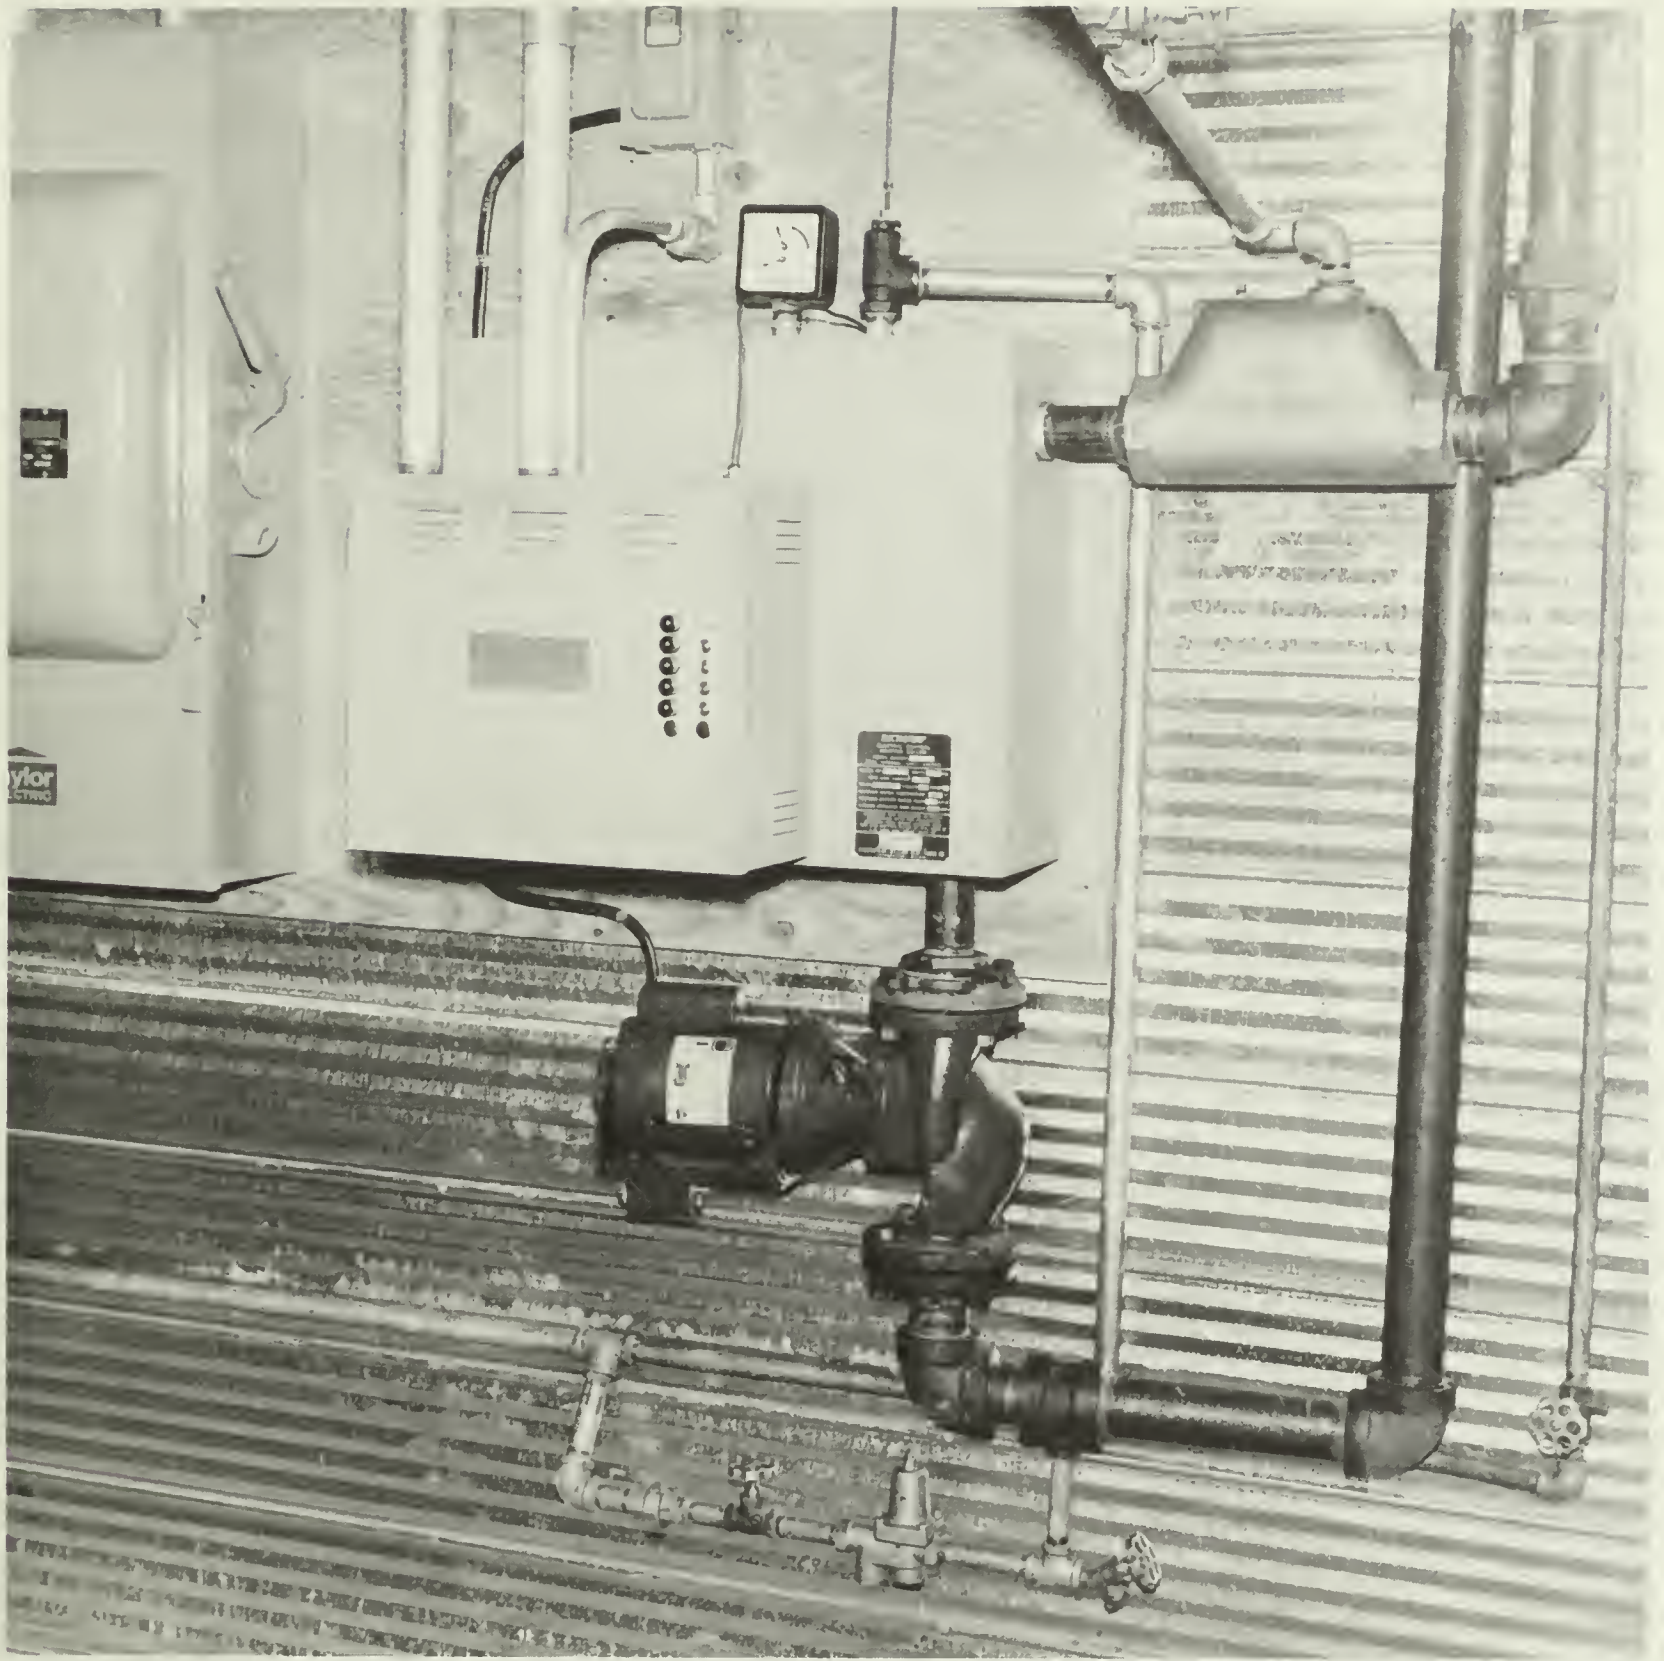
Electric circulating water heater system for floor slab heating or space heating with wall-hung smooth steel pipe.
